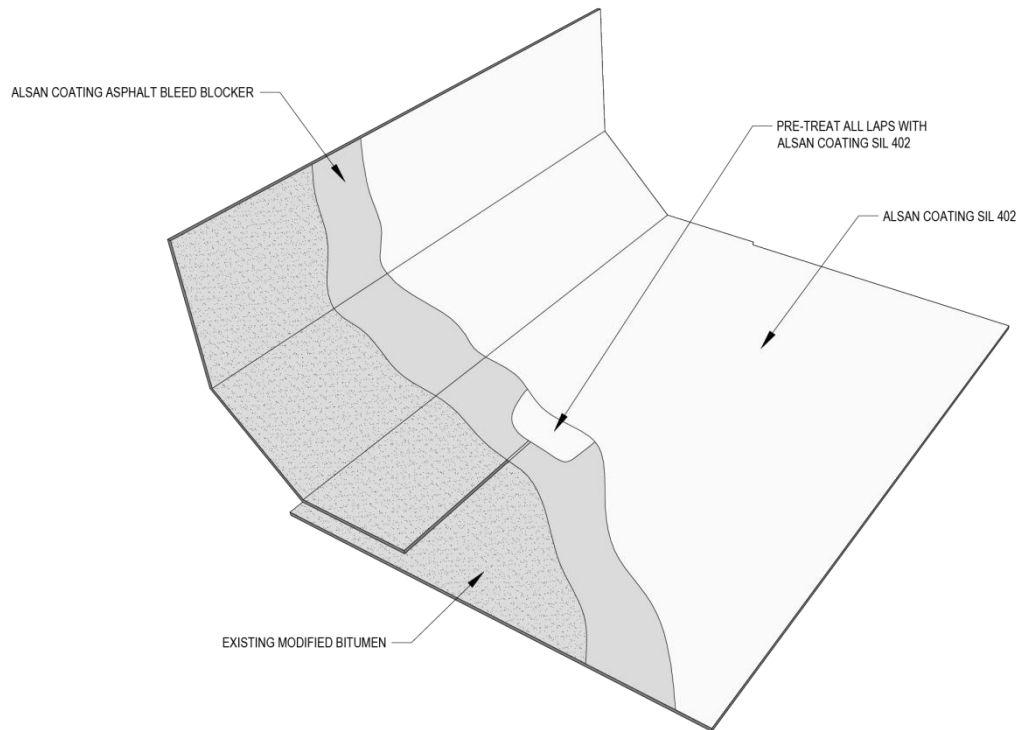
Silicone Roof Coating Over SBS Modified Bitumen, Wall/Curb
